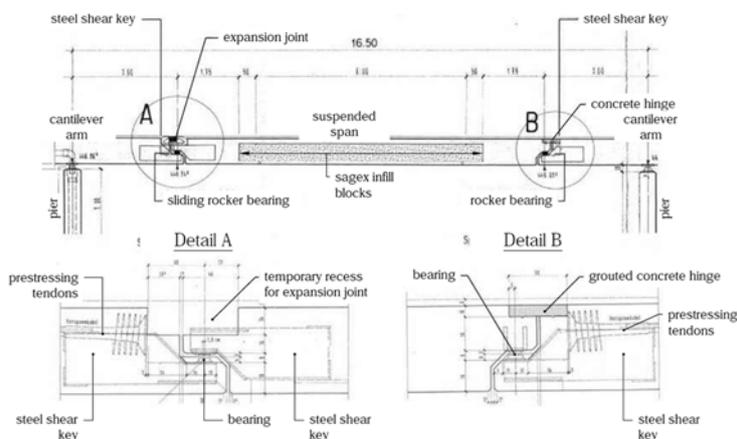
Suspended girders and diagram of joint with steel shear keys
